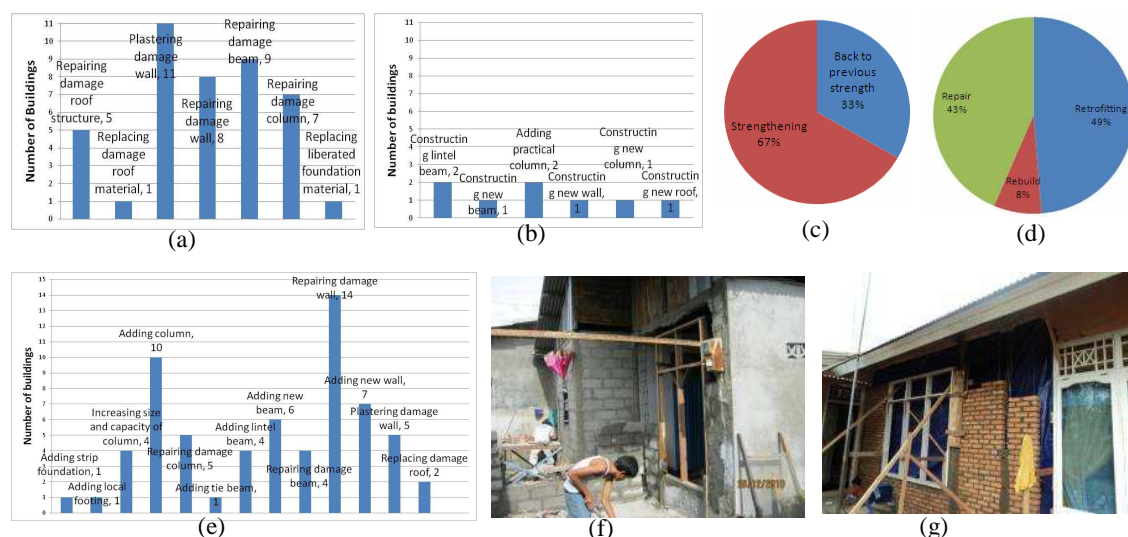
a) Repair, b) rebuild, c) intension in rebuilding, d) portion in reconstruction, e) retrofitting, f) expanding the structural layout & g) installing new practical column
